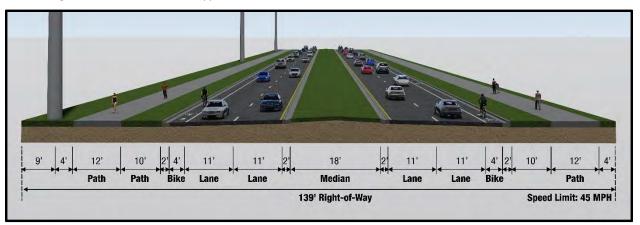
Alternative 2 – Typical Section from Partin Settlement Road to Ames Haven Road
